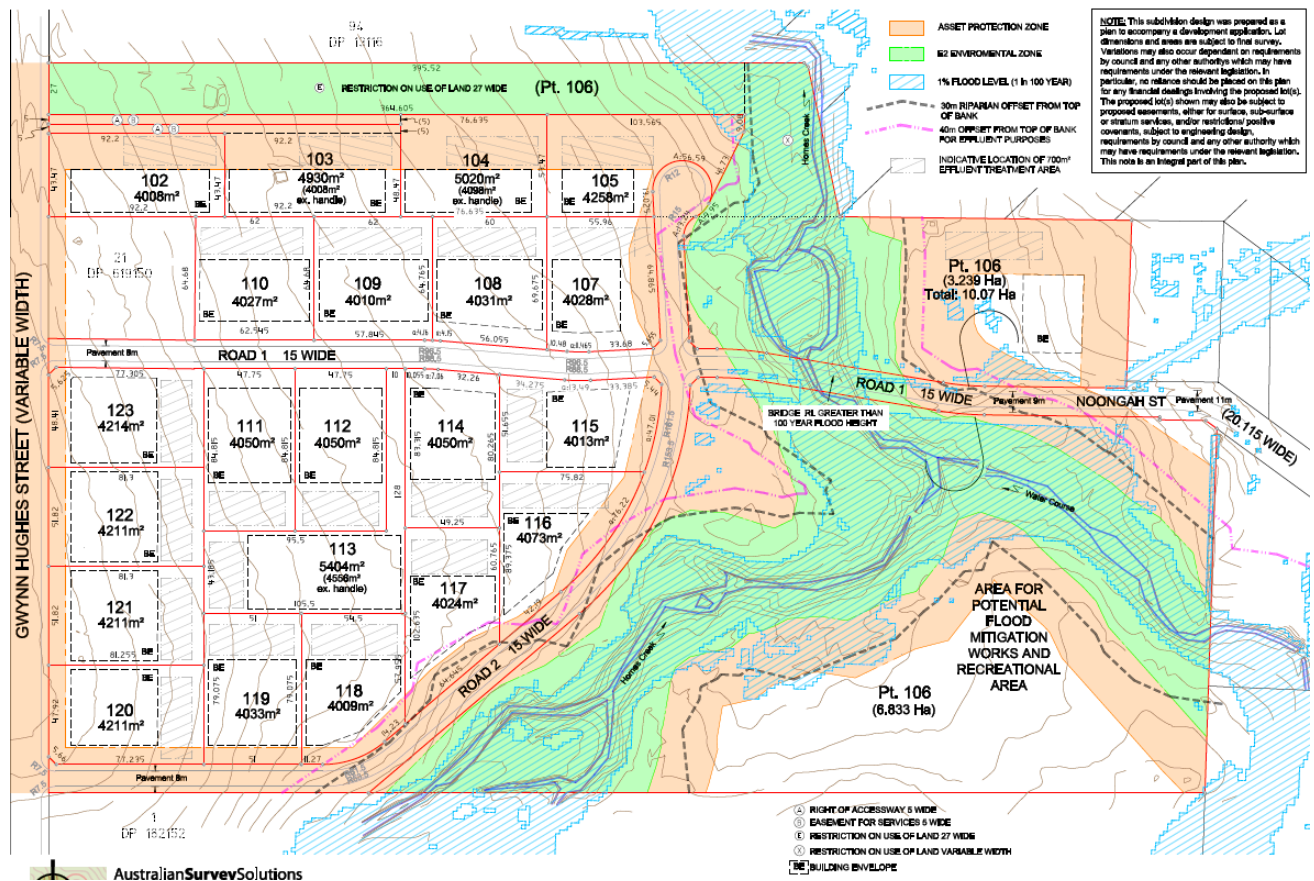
Proposed zoning and subdivision layout (Source: Proponent).
